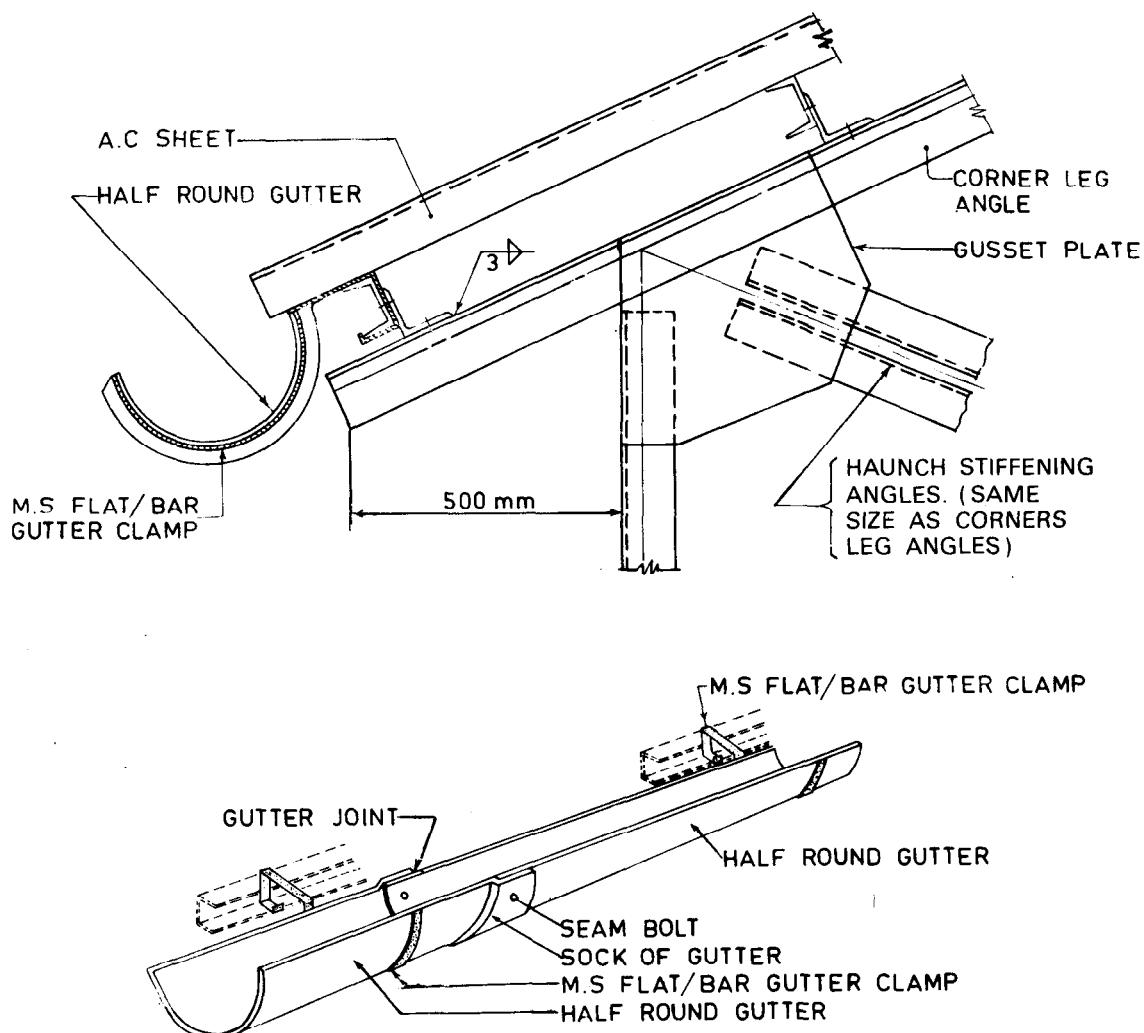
GUTTER DETAIL AT EITHER END AND STRUCTURE
